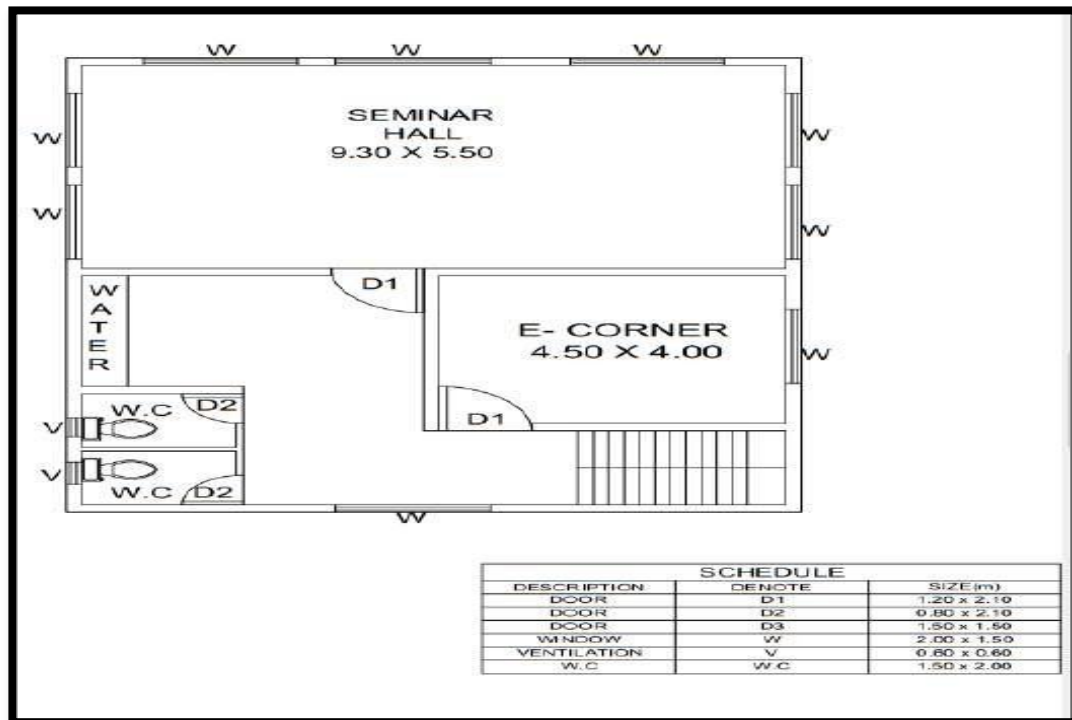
(b) Plan of the First floor of Skill Development Centre
